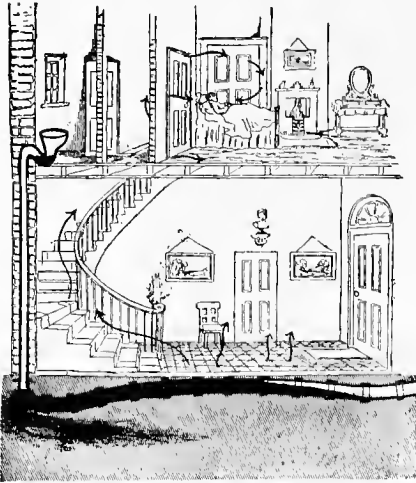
Drain under house with fall wrong way. Broken pipe at the junction with "soil pipe."
